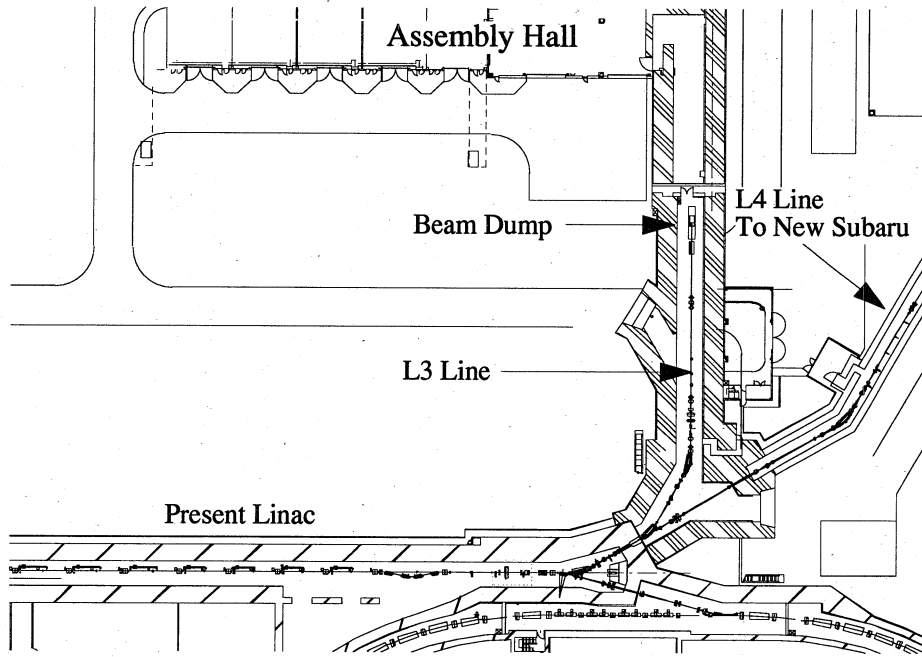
Future layout of SPring-8 Linac beam lines. L3 and L4 beam lines will be start construction from this fall.
